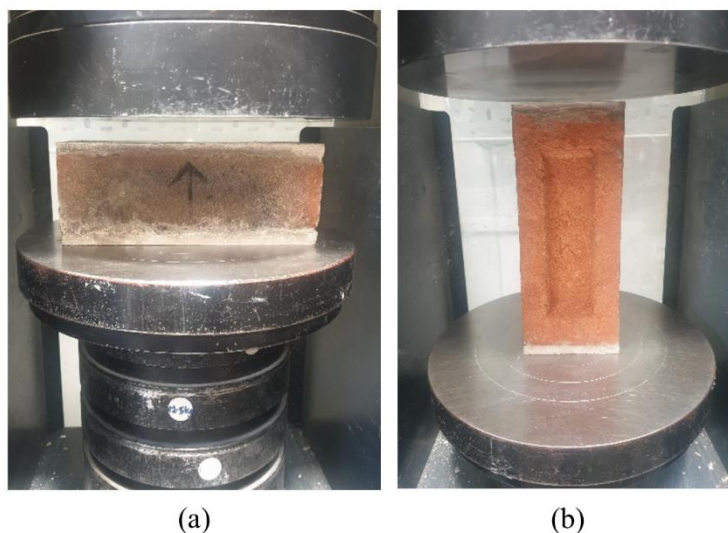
Compression tests on brick units: (a) load perpendicular to bed joints; (b) load parallel to bed joints.
